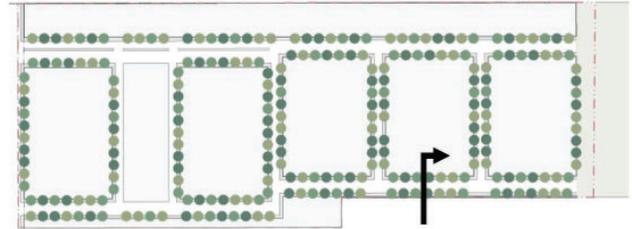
Southern East-West Street - 74-foot Right of Way - Southern
